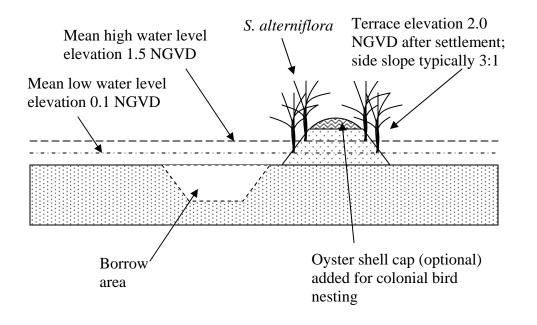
Cross sectional view of typical terraces constructed at Pierce Marsh. Water level elevations are determined from via bathymetric survey. Typical terrace elevations and water levels are given in National Geodetic Vertical Datum (NGVD). Terraces were constructed with a 3:1 side slope using material taken from the adjacent borrow area.
